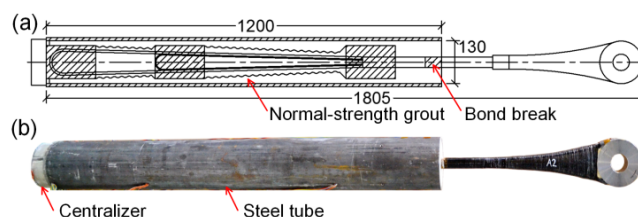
CFRP two-strap anchor specimen: (a) schematic (dimensions in [mm]); (b) photo
